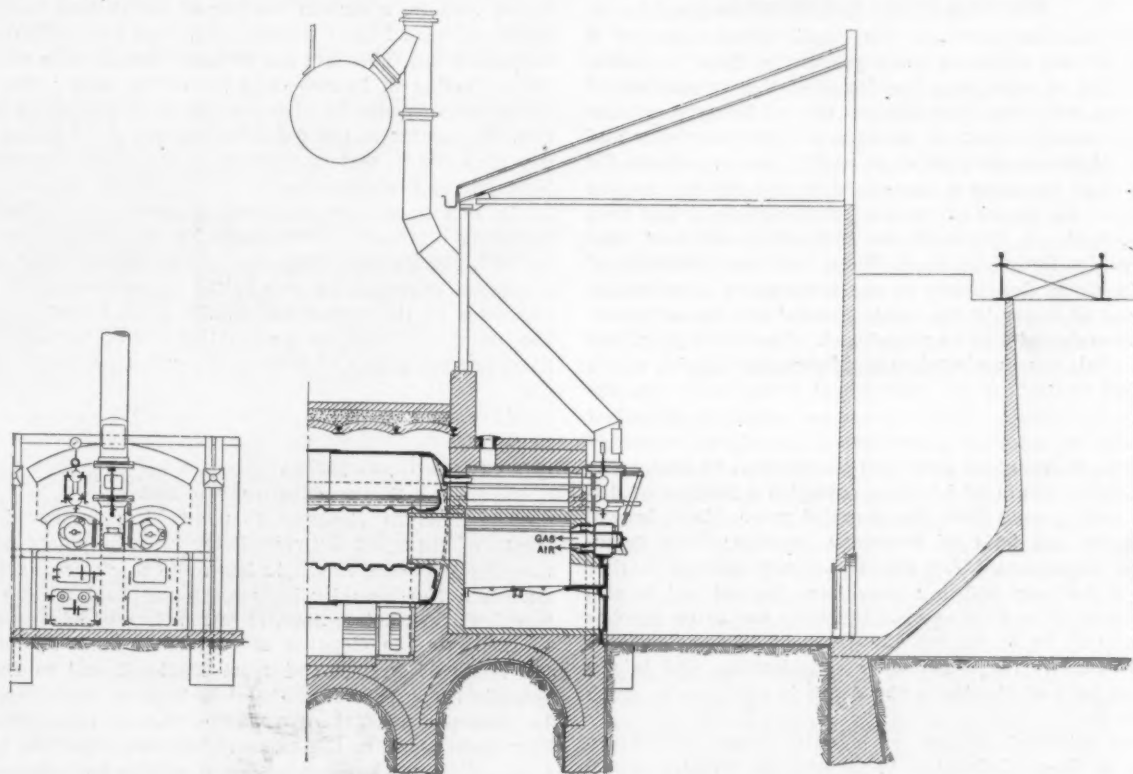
Firing Rolling Mill Rollers with Blast Furnace Gas.
